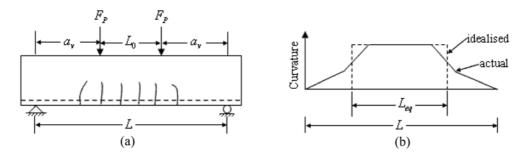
A simply supported prestressed concrete beam with unbonded steel: (a) arrangement of loading; (b) actual and idealized curvature distribution along the beam (Au and Du 2004)
